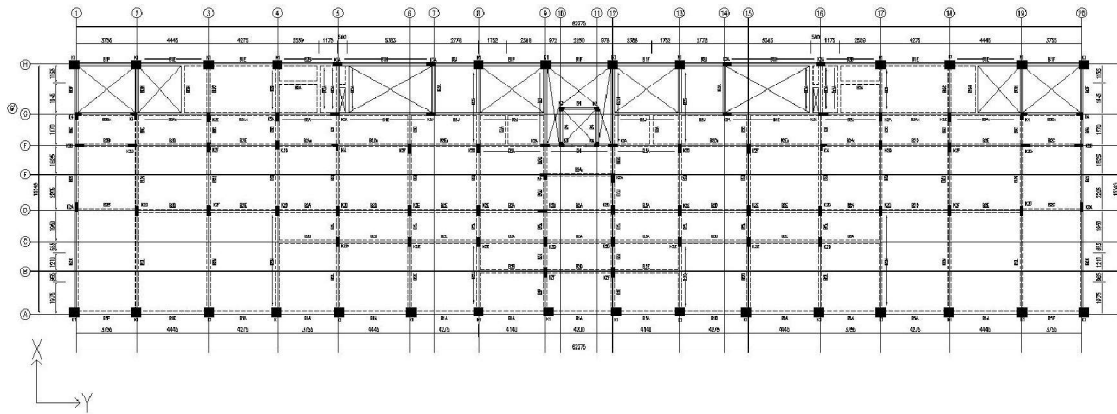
Typical Floor Plan (1st floor – 3rd floor)
